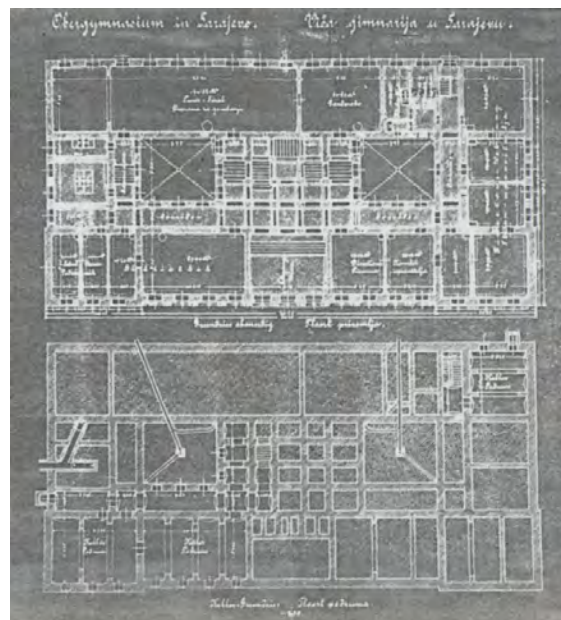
Gymnasium in Sarajevo; foundations and ground floor plans.
